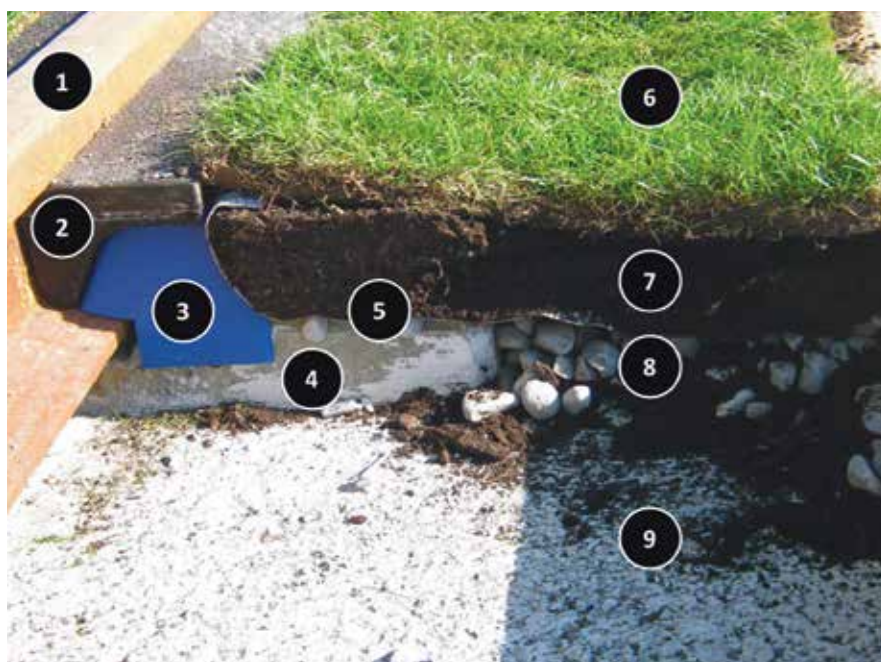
Green track profile. 1: rail, 2: rail insulation, 3: rail fastening insulation, 4: reinforced concrete filler block, 5: geotextile layer, 6: turf, 7: vegetation base layer, 8: filter layer, 9: concrete base slab. (Image modified from Corsi 2017)
